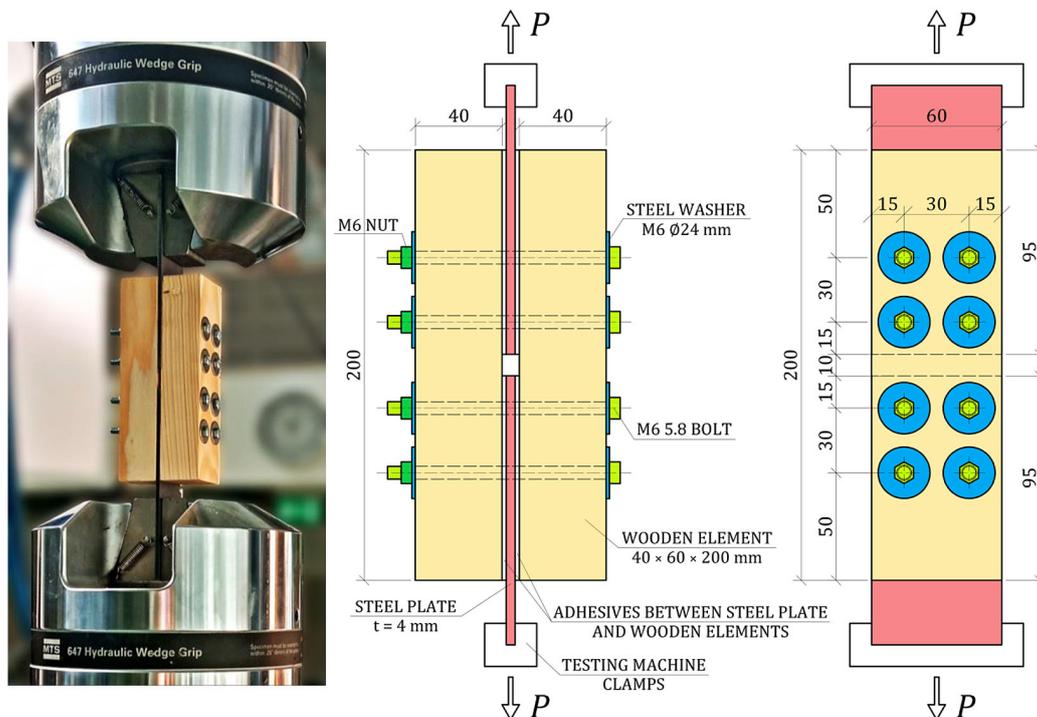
Experimental setup: laboratory testing stand and described testing scheme – front and side view (dimensions in mm)
